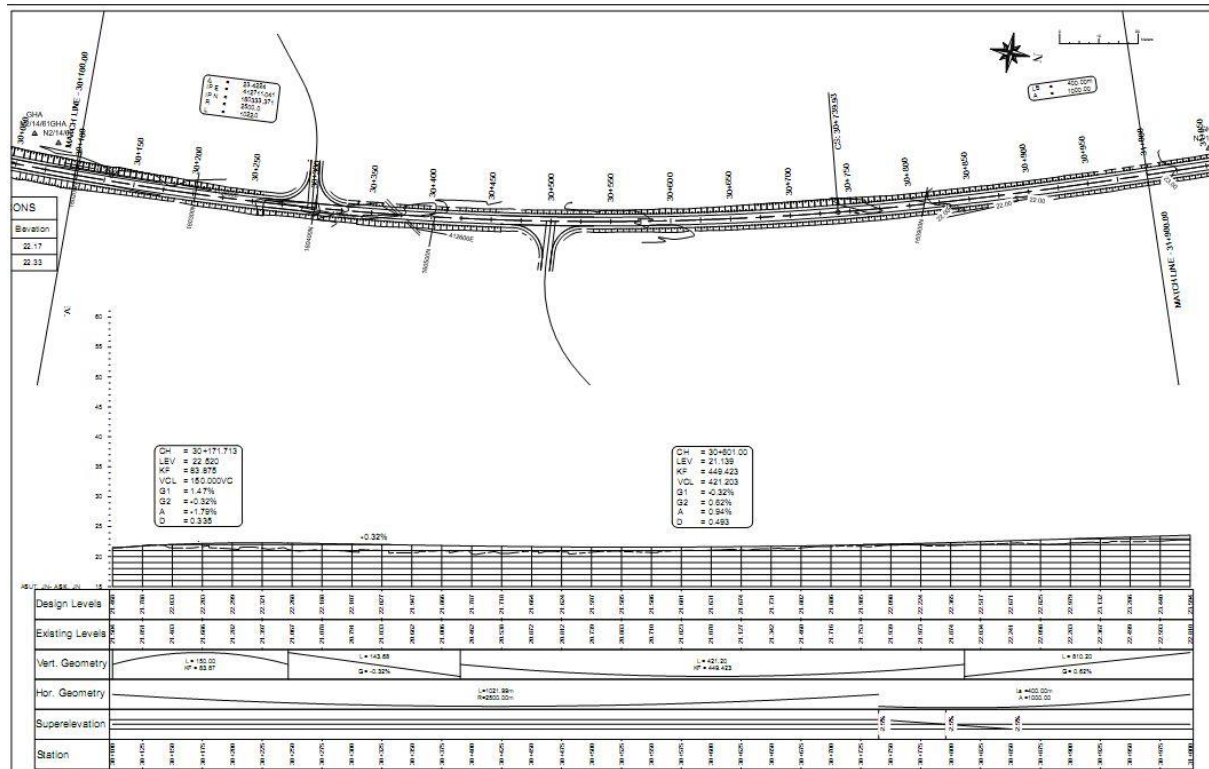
Sample Road Plan and Profile for Sections 1 and 3 Project Roads
